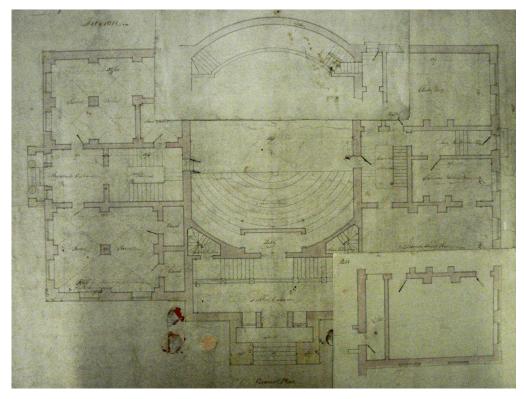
Proposed ground plan for Preston Sessions House, Rickman and Hutchinson, 1825 (LRO QSV/12)
